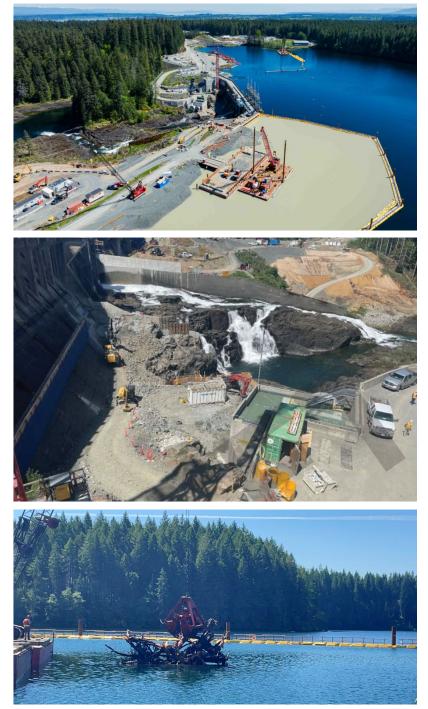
Top: View of the North Earthfill Dam berm densification work. Middle: View of left training wall and rock foundation preparation downstream of Concrete Main Dam. Bottom: Middle Earthfill Dam silt curtain installation and stump removal in advance of dredging.
